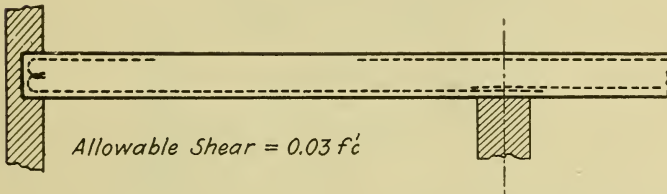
Typical Reinforced Concrete Beam; Principal Longitudinal Bars Anchored.
